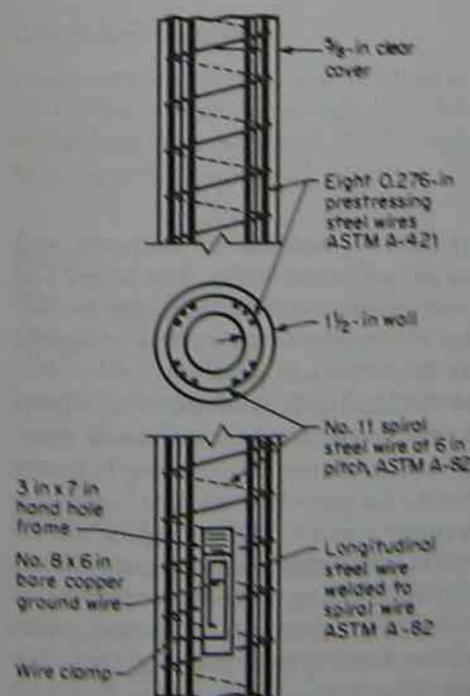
Typical reinforced concrete hollow pole section. (Courtesy Centracon, Inc.)
